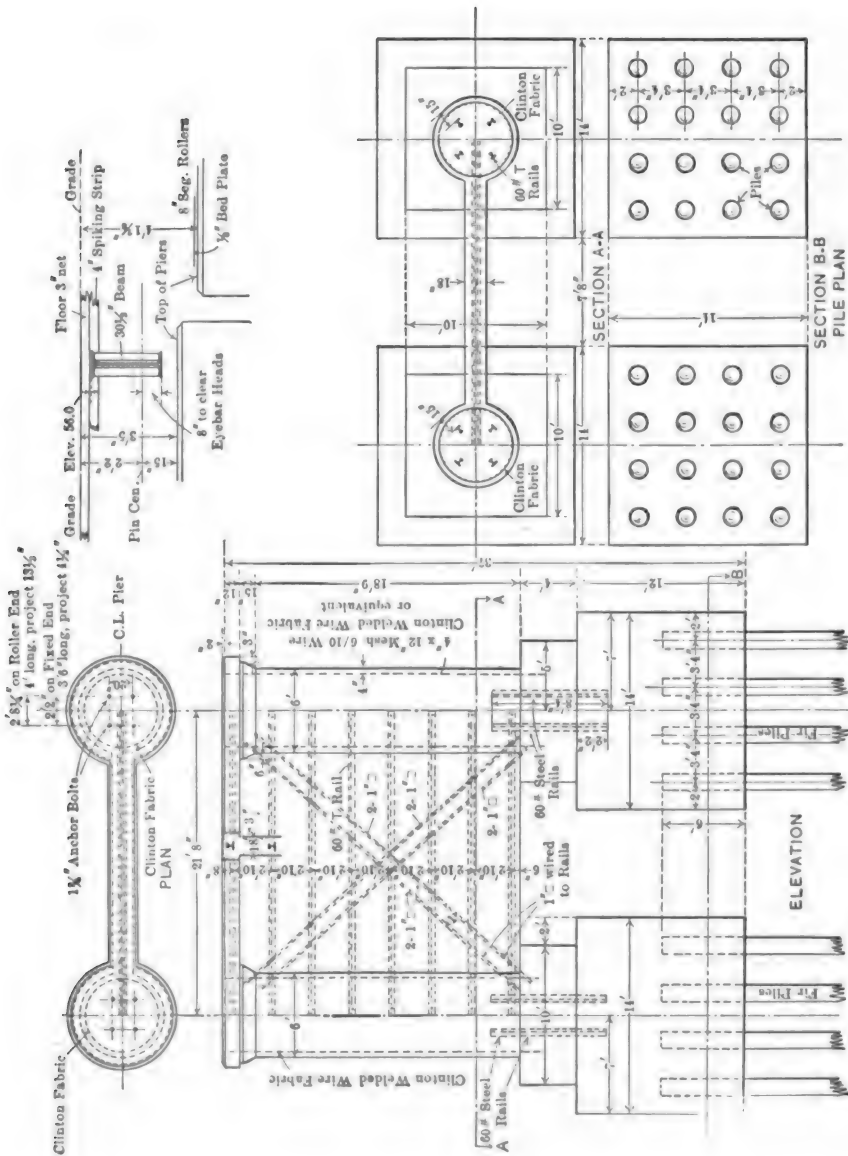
REINFORCED CONCRETE PIERS, BELLINGHAM, WASH.
